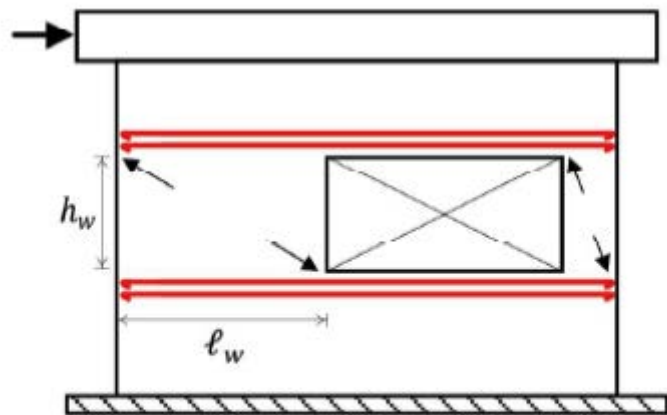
Required horizontal reinforcement in wall segments above and below wall piers at the edge of a wall.
